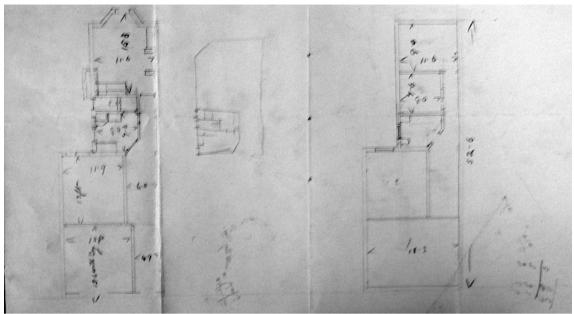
Sketch floor plan by E. Stone for houses along Brownhill Road for the builder H. Woodham, 1907, showing a process of working out room sizes. For many of the houses Norfolk & Prior worked on, there are no floor plans or elevations in their archive, only block plans for building applications (Ibid., Item 633).
